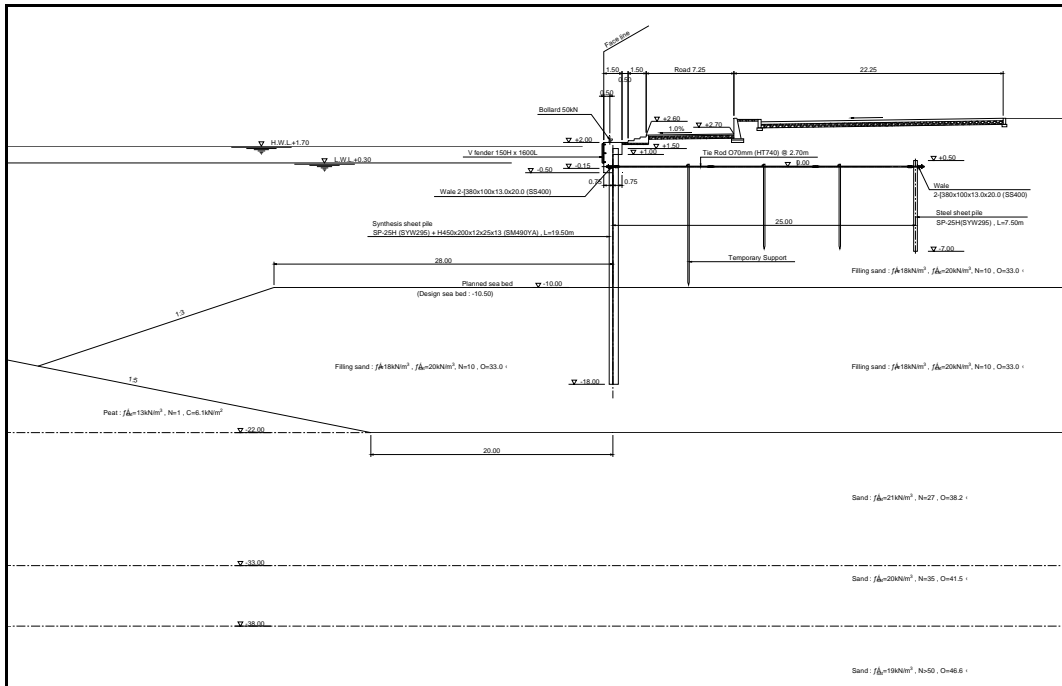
Typical Section of -10m NSQ for Pilot Boat No.2
